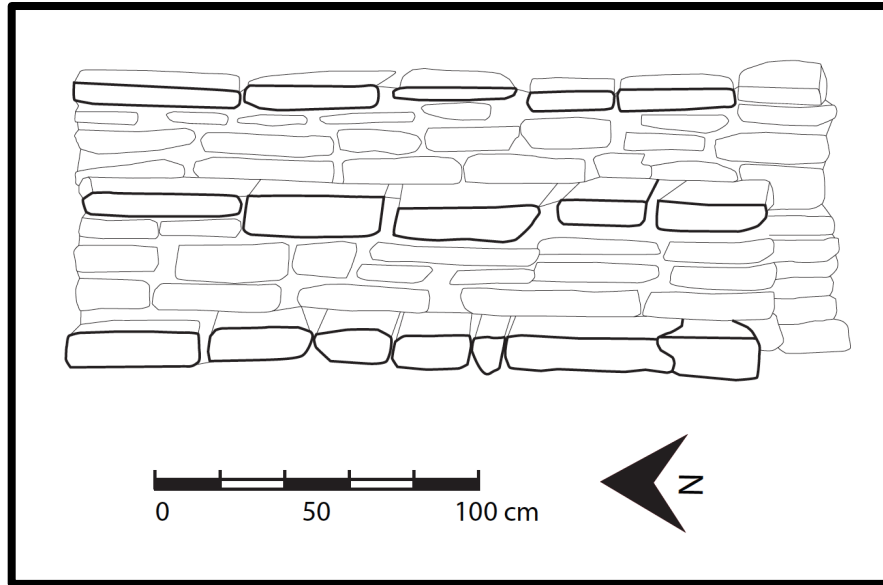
F.6/36W/1 Western-facing stair block of Structure 6.
